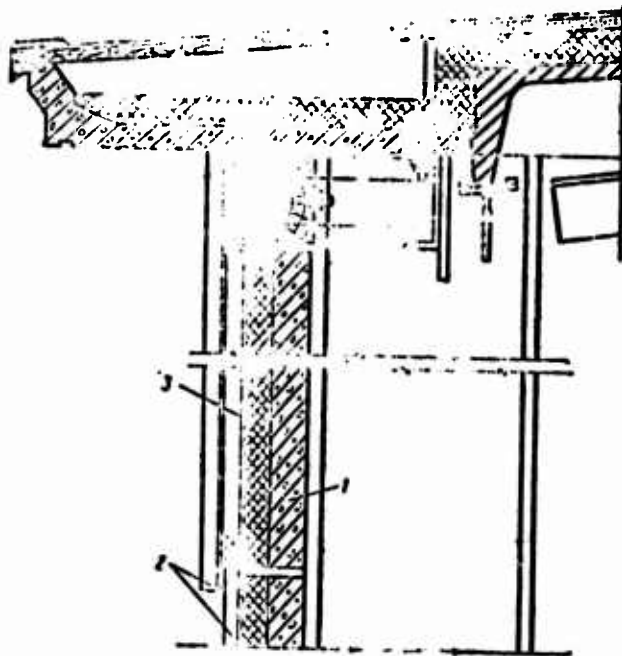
The part of the wall filling of a tower pile driver frame with large wall panels along with supporting prestressed and light facing slabs: 1 - supporting prestressed slab with standard sizes, 6×1.2 and 9×1.2 m; 2 - light facing slabs; 3 - heat insulation.
